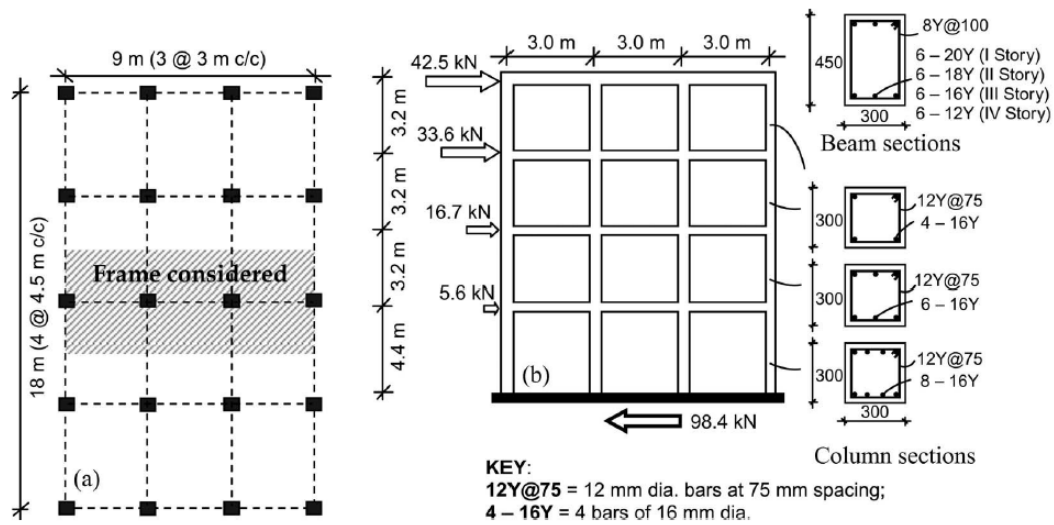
Details of the four-story RC building considered in the present study (a) Plan of the building; (b) Elevation of the frame and section (Kaushik *et. al.*, 2009)
